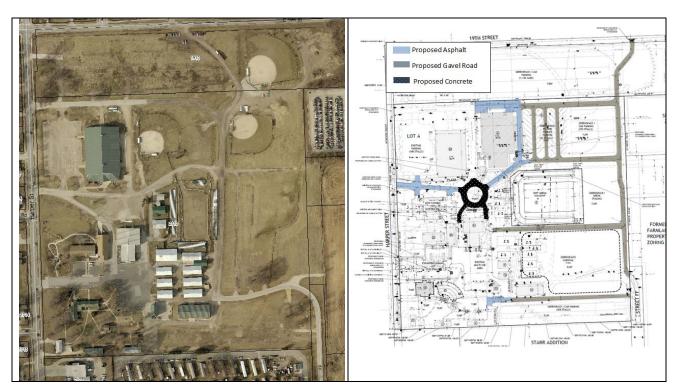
Existing roadway network within the	Figure 3b. Proposed roadway network within
